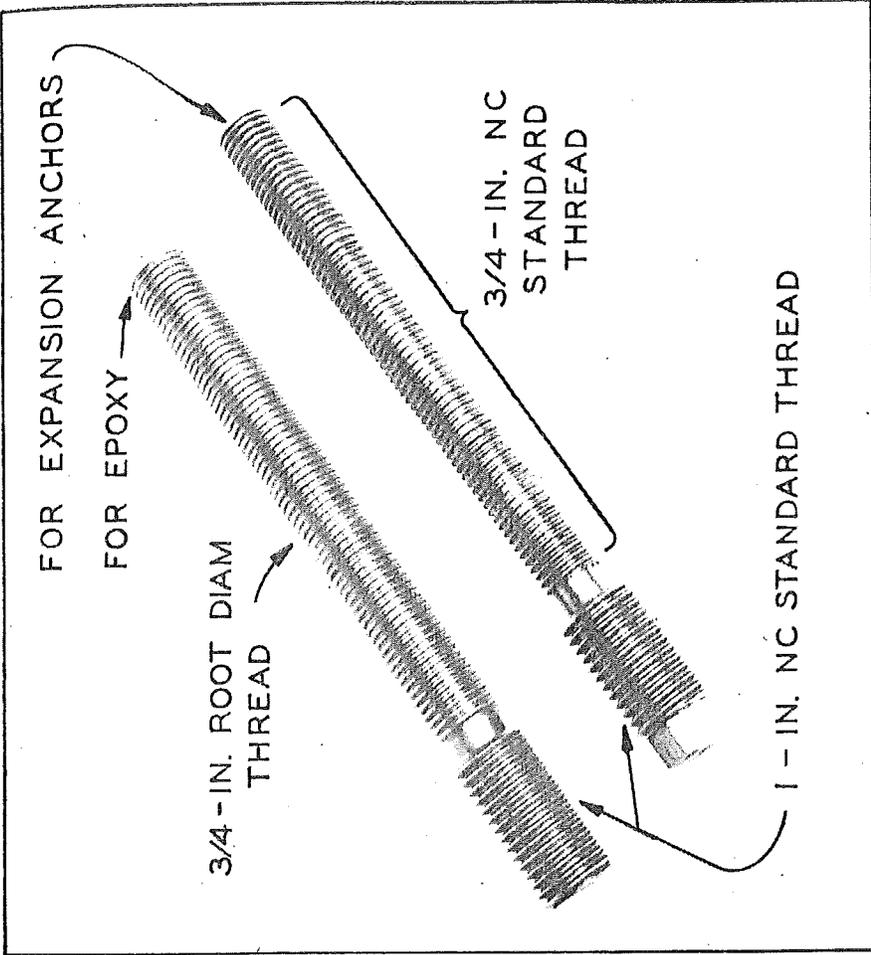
Typical test bars, with 1-in. standard thread to fit load frame drawbar.
